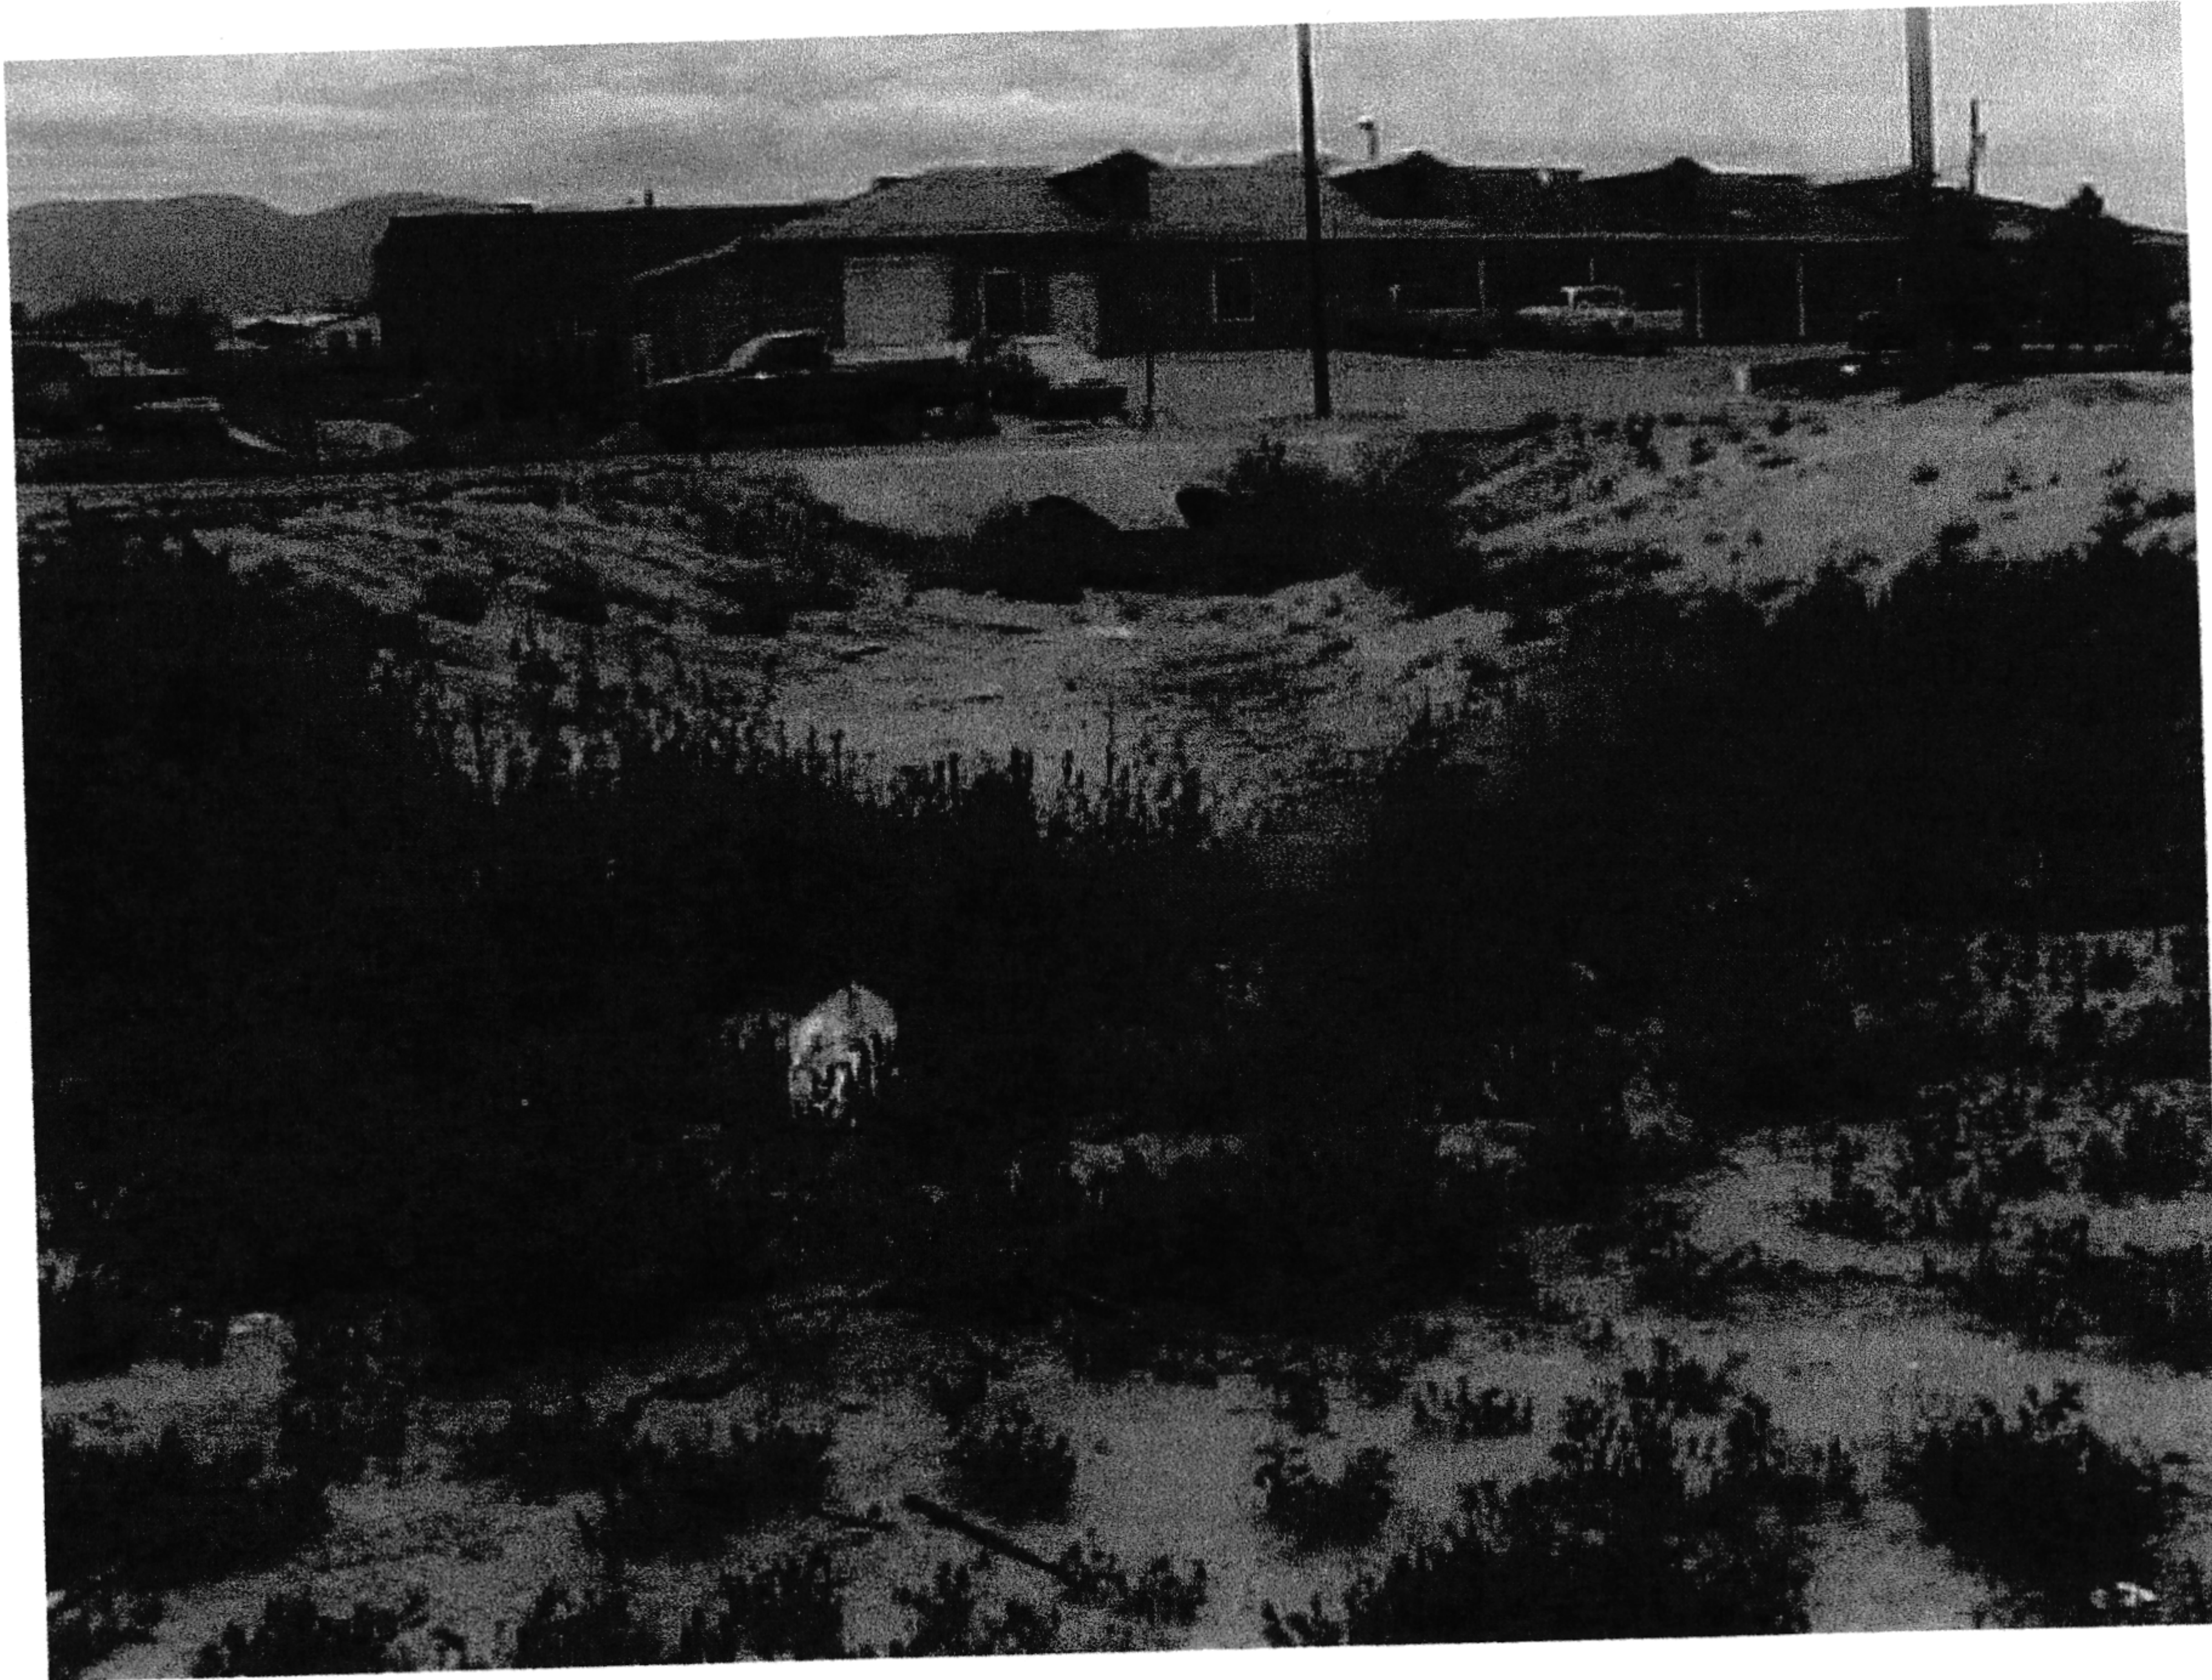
36" Culvert Outlets. Looking east, area that photo was taken is higher than San Pedro Crossing.
